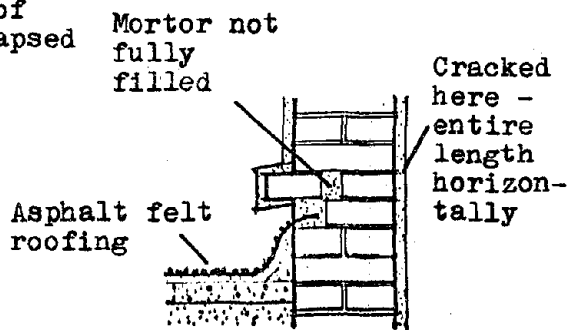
Profile (sectional) of parapet of engine room bldg. of Beijing Telephone Office
